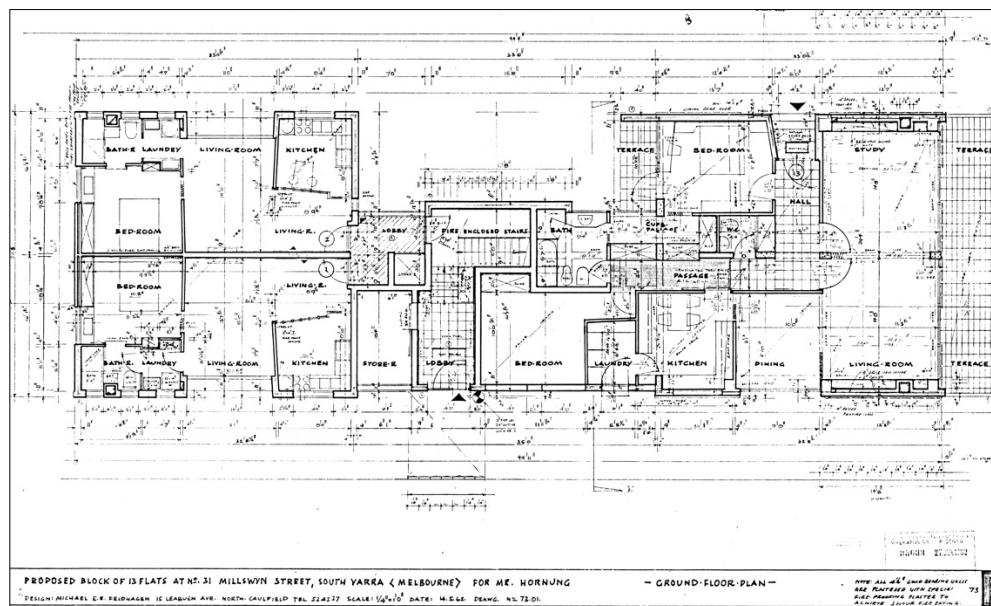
Ground floor plan, 1962. Source: City of Melbourne.
